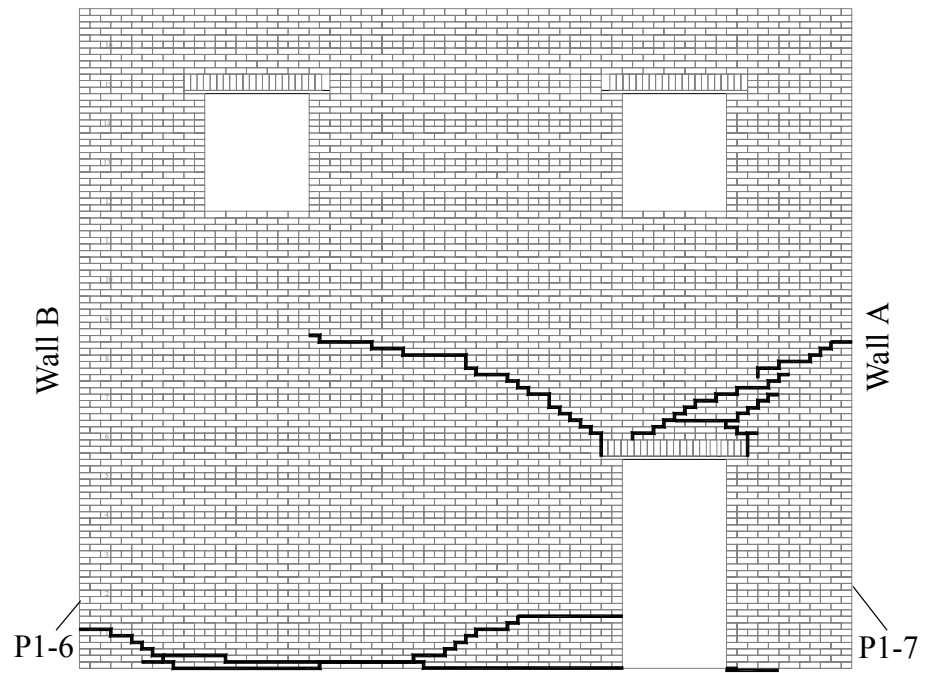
Crack pattern of Wall 1 following Test Run 10.
